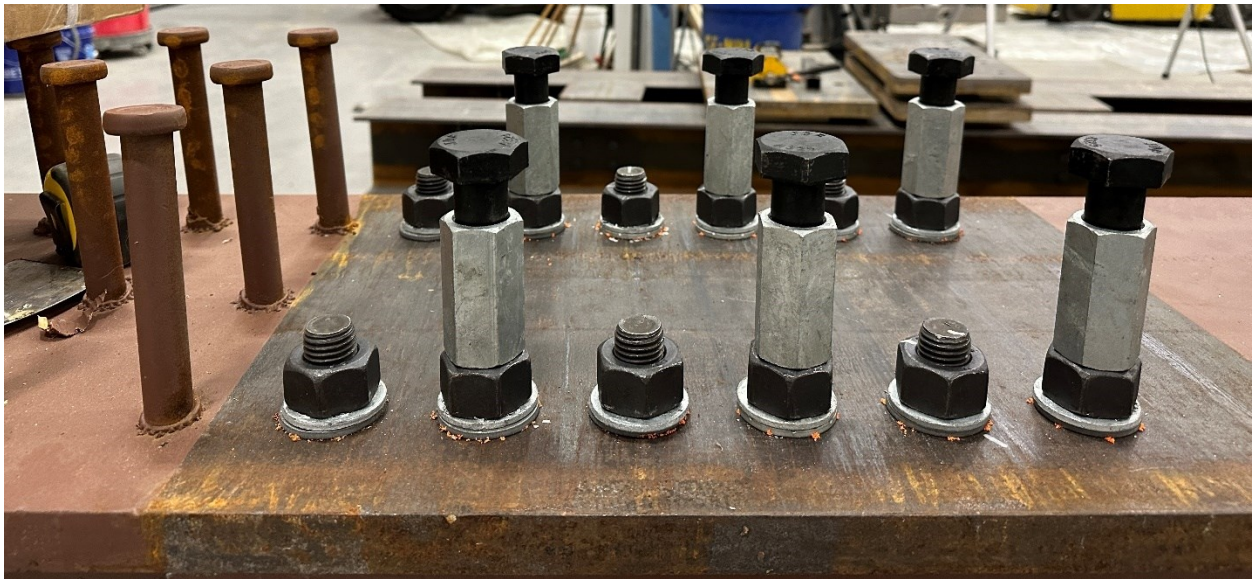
Couplers and Additional Bolts Acting as Headed Studs for Brackets.
